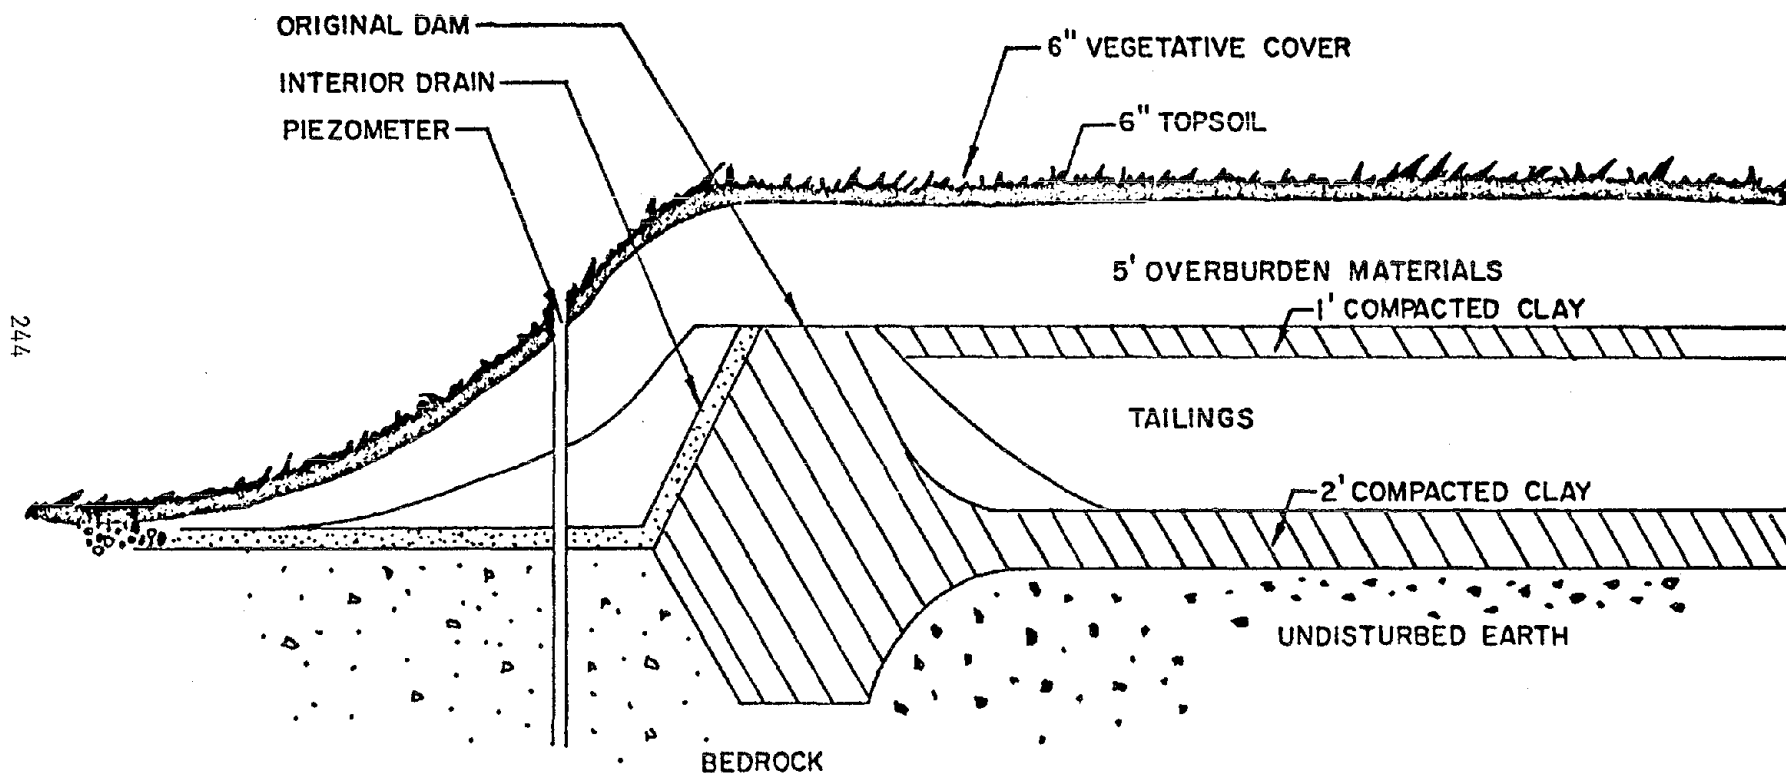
CROSS SECTION TYPICAL RECLAIMED MILL TAILINGS POND
